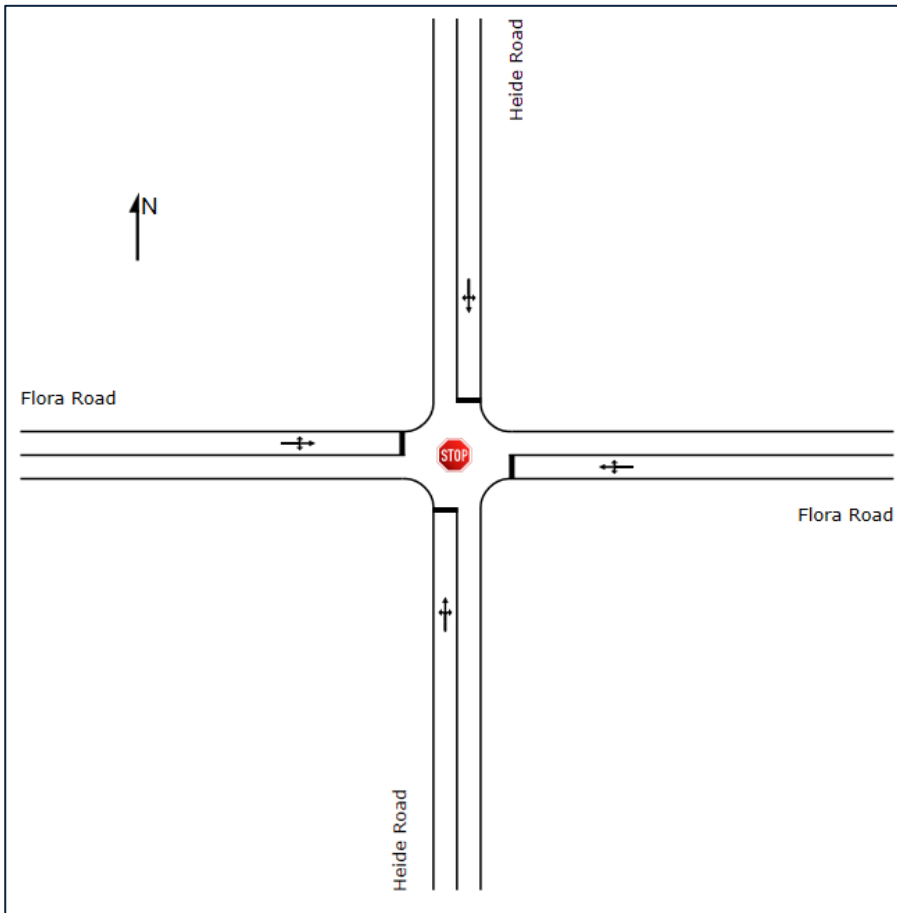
Existing Intersection Layout: Heide Road and Flora Road
